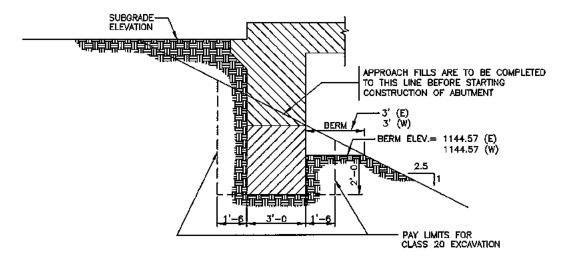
DETAILS OF PLACEMENT OF ENGINEERING FABRIC
